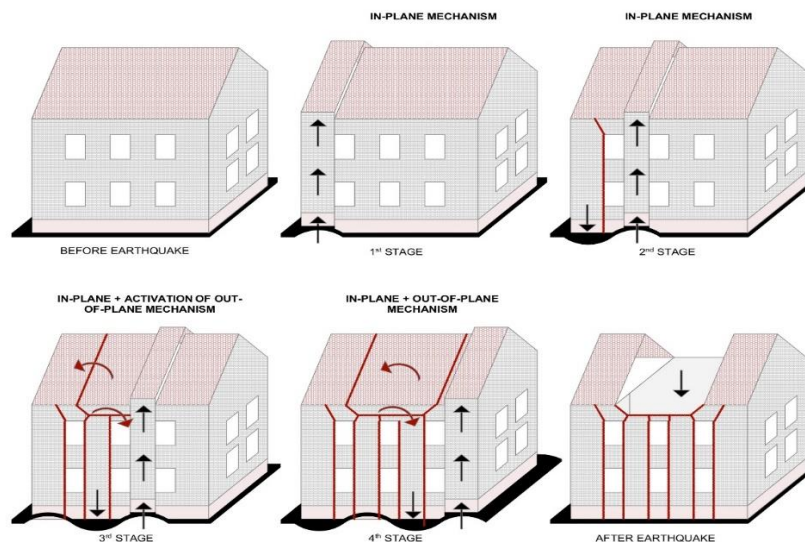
Particular combination of in-plane and out-of-plane failure mechanism for masonry building in the epicentre of shallow earthquakes [174]
